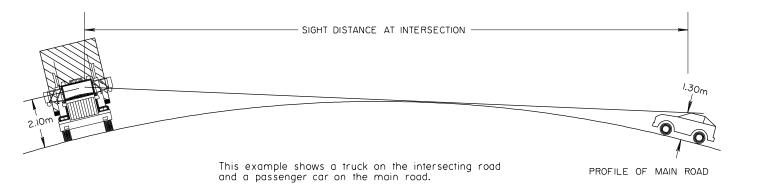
Ib SIGHT LINE (VERTICAL PLANE)
